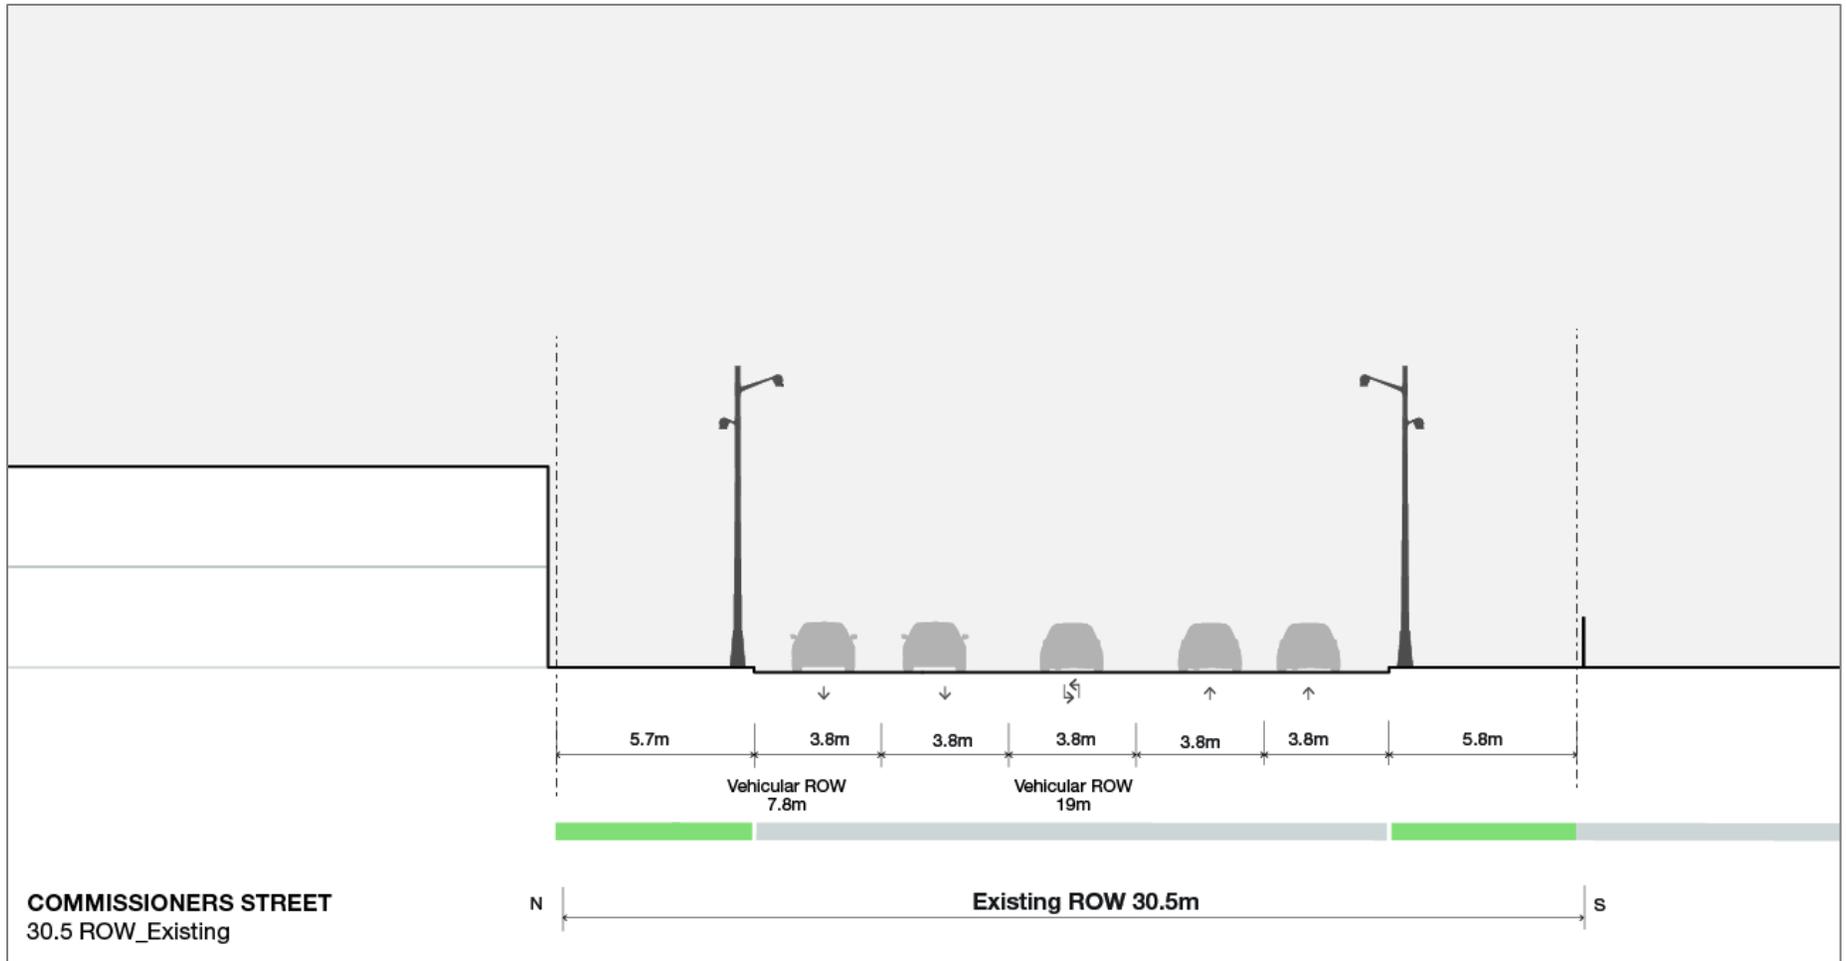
CROSS-SECTION – EXISTING COMMISSIONERS STREET, AT CANADA POST FRONTAGE
